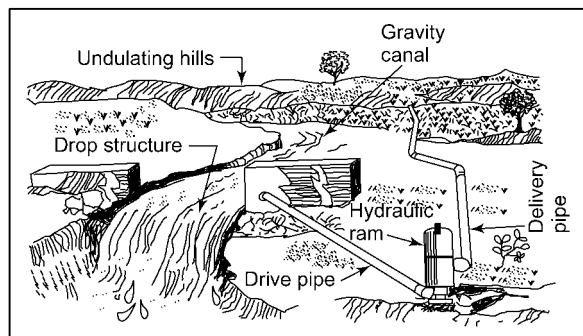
Schematic sketch illustrating the installation of a hydraulic ram at a canal drop
